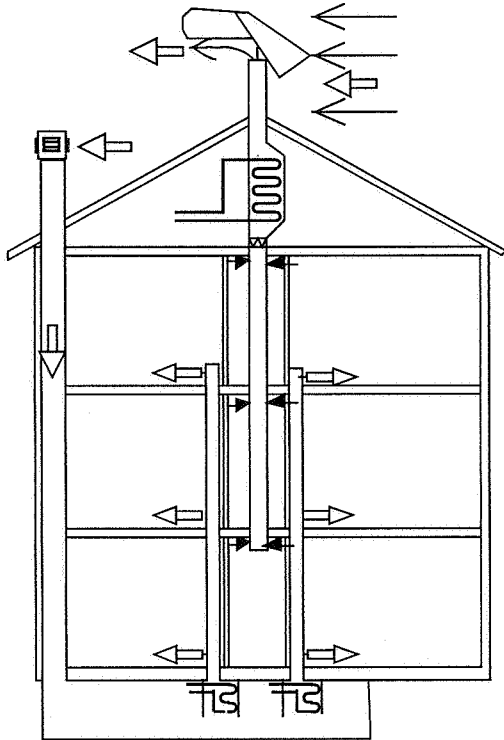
Separated heat recovery system with internal air supply. Outdoor air intake at roof level.
